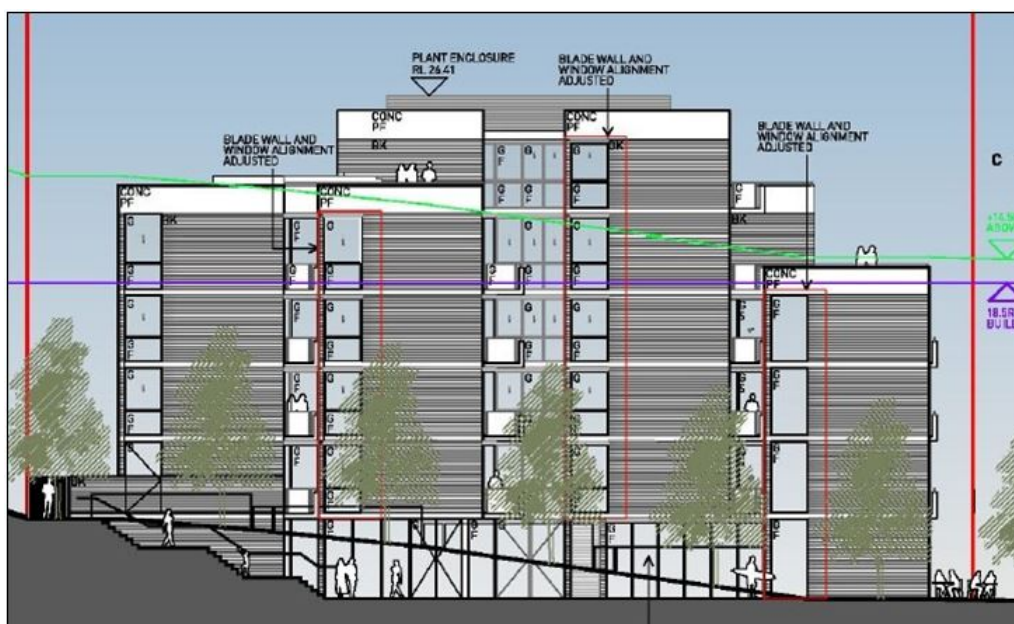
DA 49519/2016 Kurrawyba Avenue Elevation
